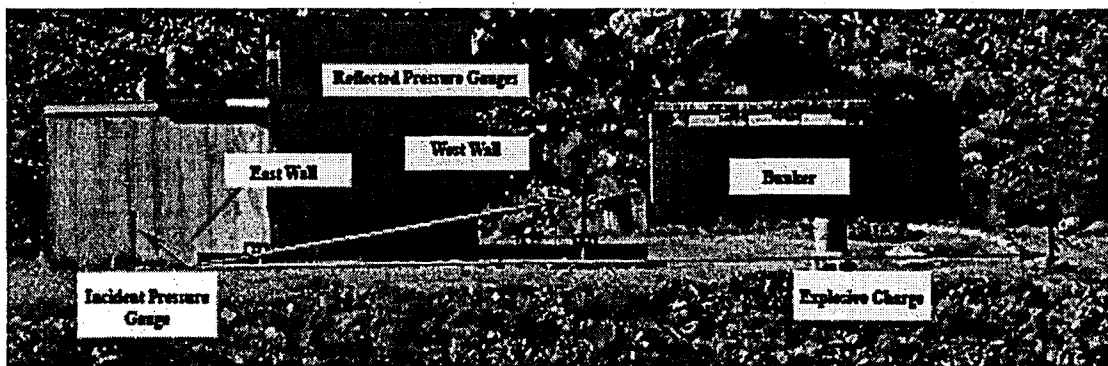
East Side View of Blast Test Set-up and Instrumentation Blast Loading and Predictions
